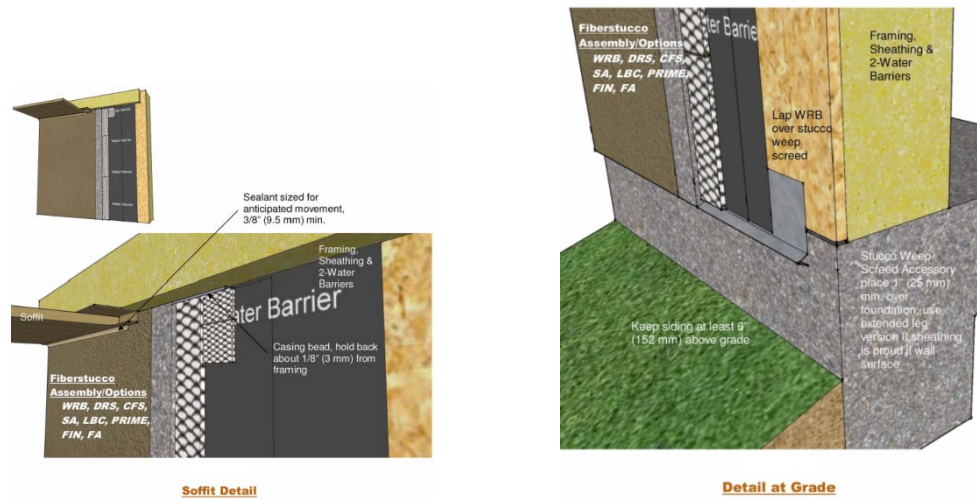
TYPICAL INSTALLATION DETAILS (CONTINUED)
